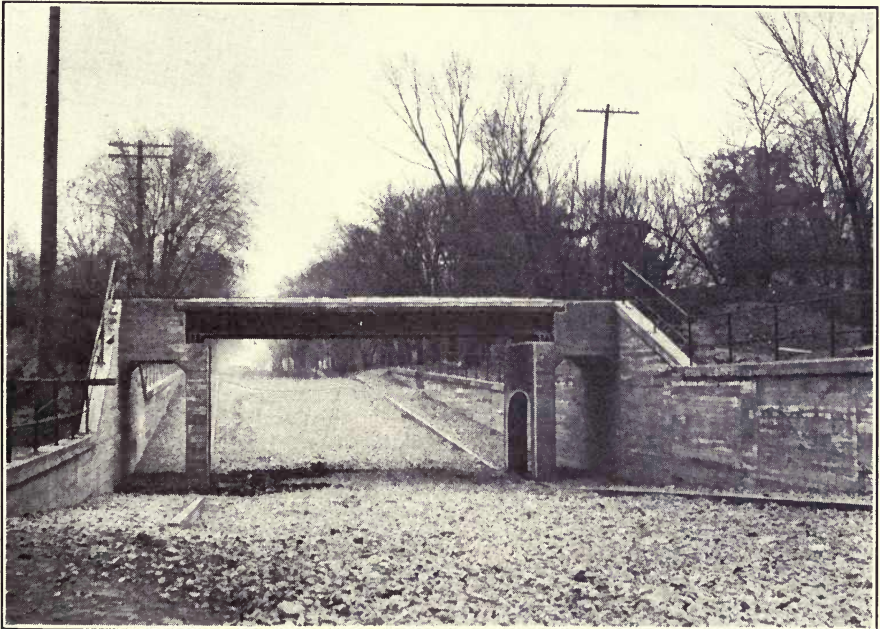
DECK GIRDER BRIDGE FLOOR, C., B. & Q. R. R
